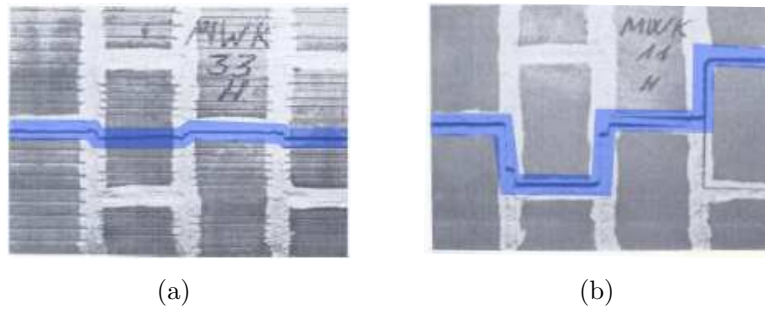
Failure modes of masonry walls under direct tension: (a) cracks passing along mortar and bricks and (b) zigzag type for load parallel to bed joint orientation, from [Backes \(1985\)](#).
